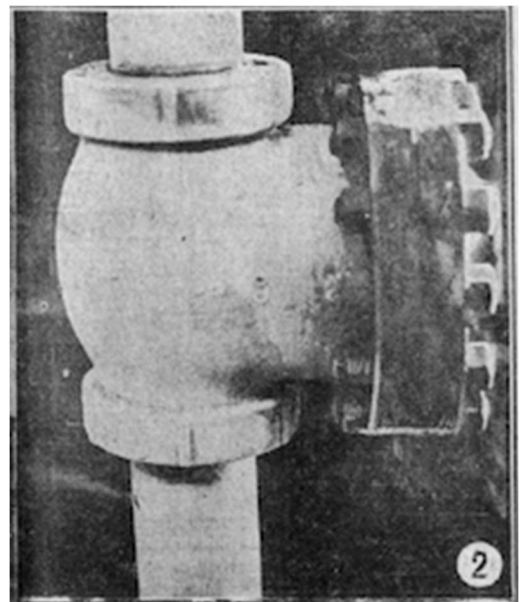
Valve installed onto the 6 inch casing. Note handling joint above.
